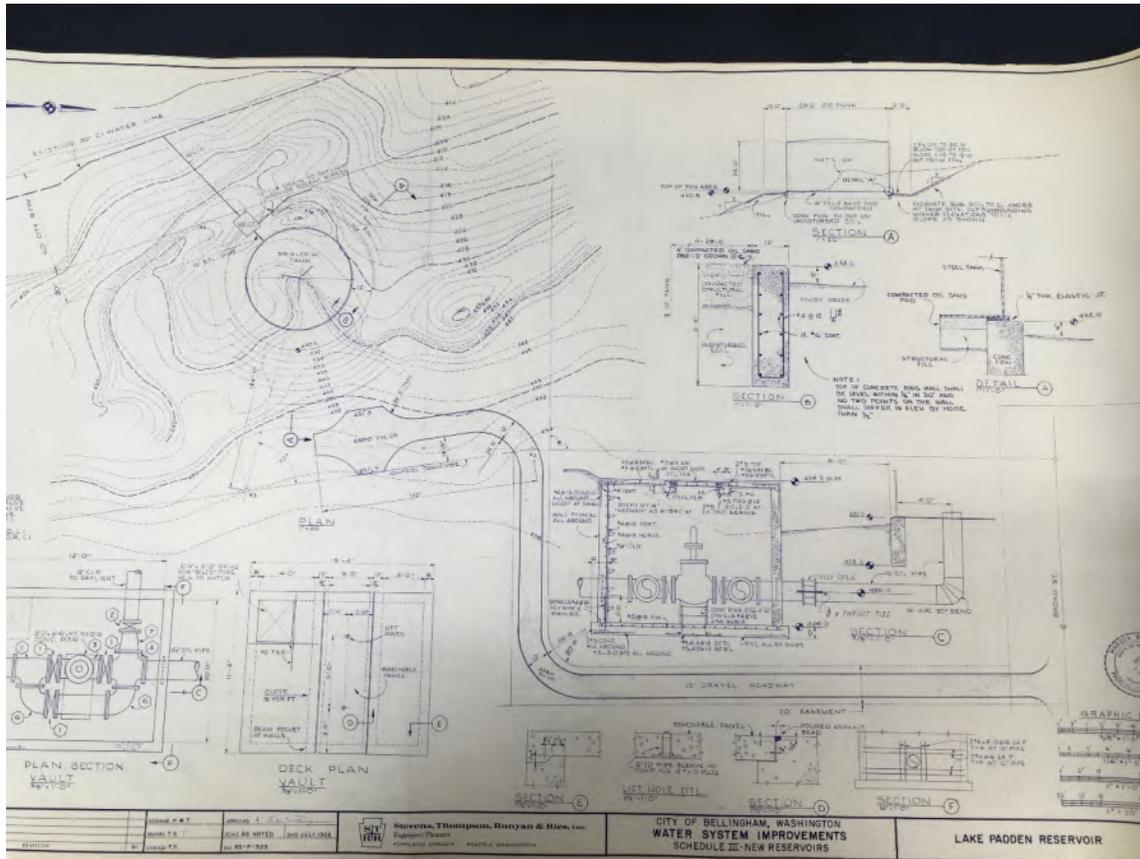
Padden – Lake Padden Reservoir (only drawing sheet available, this sheet has footing information)
